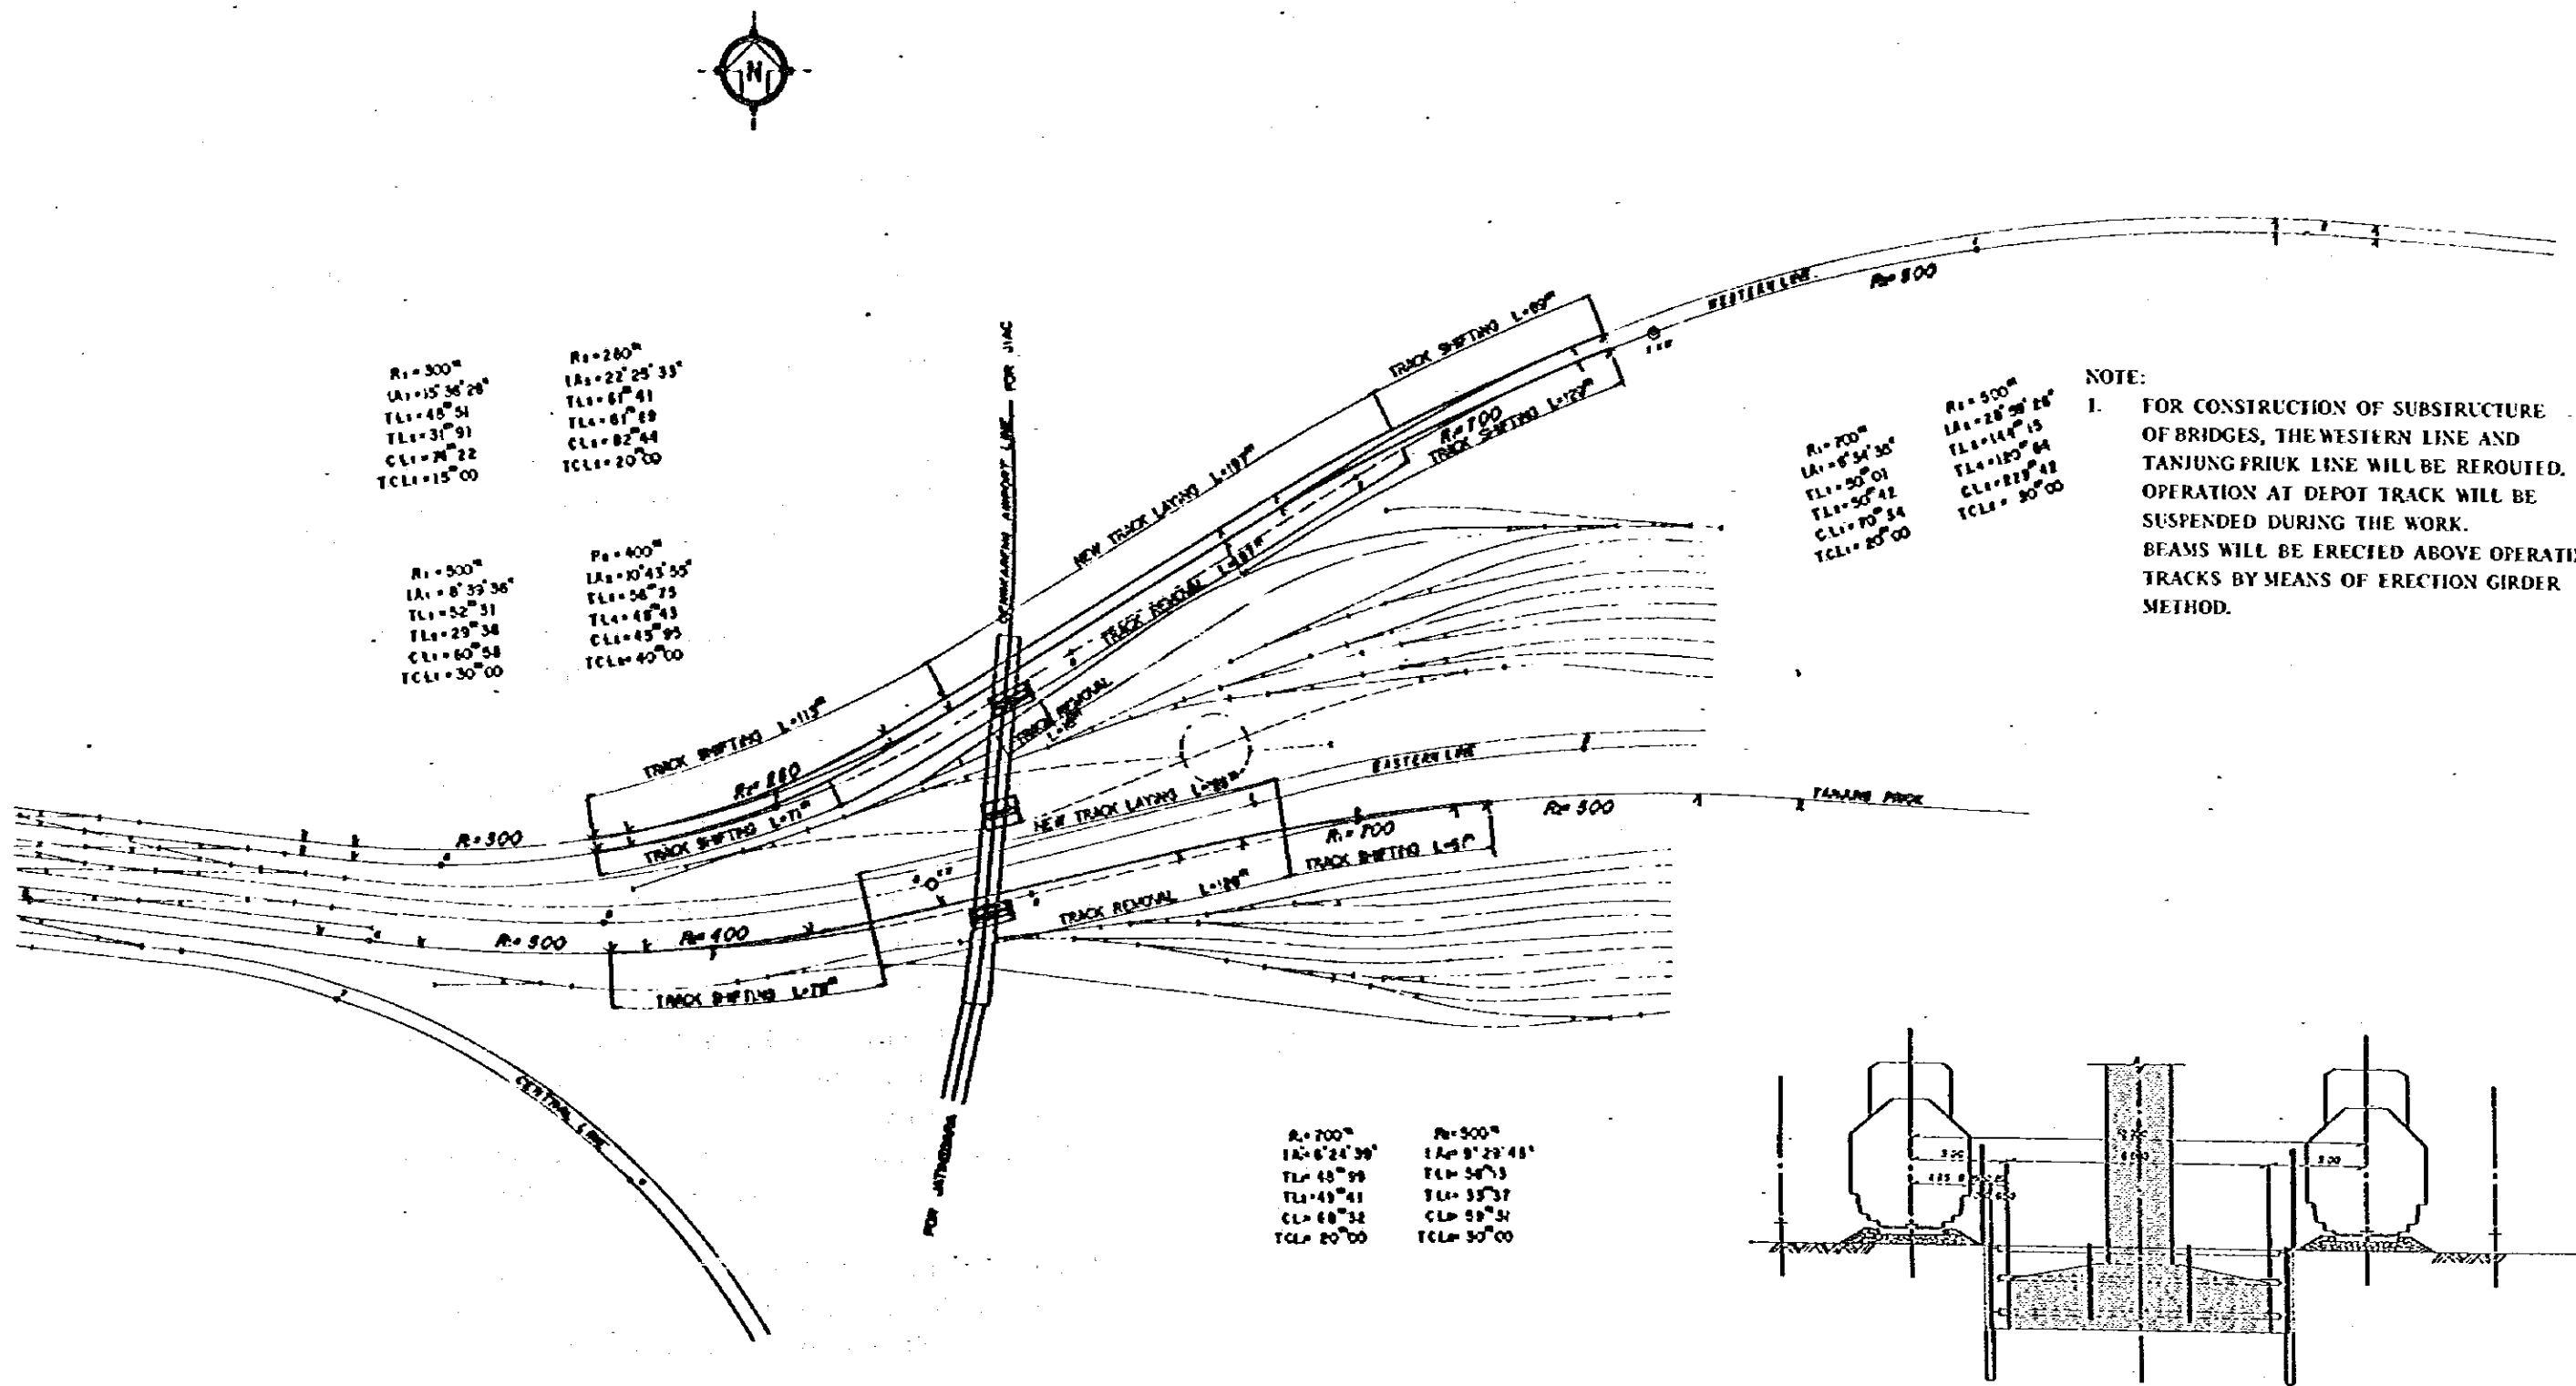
Rerouting Plan in Eastern Part of Kota Station
